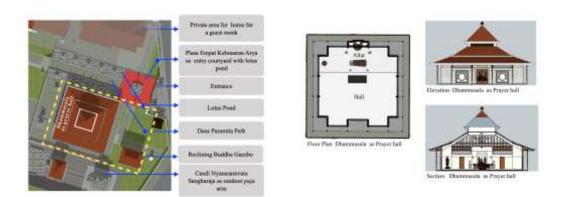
Site Plan Dhammasala as the Prayer Hall at Vihara Mendut Source: Author
